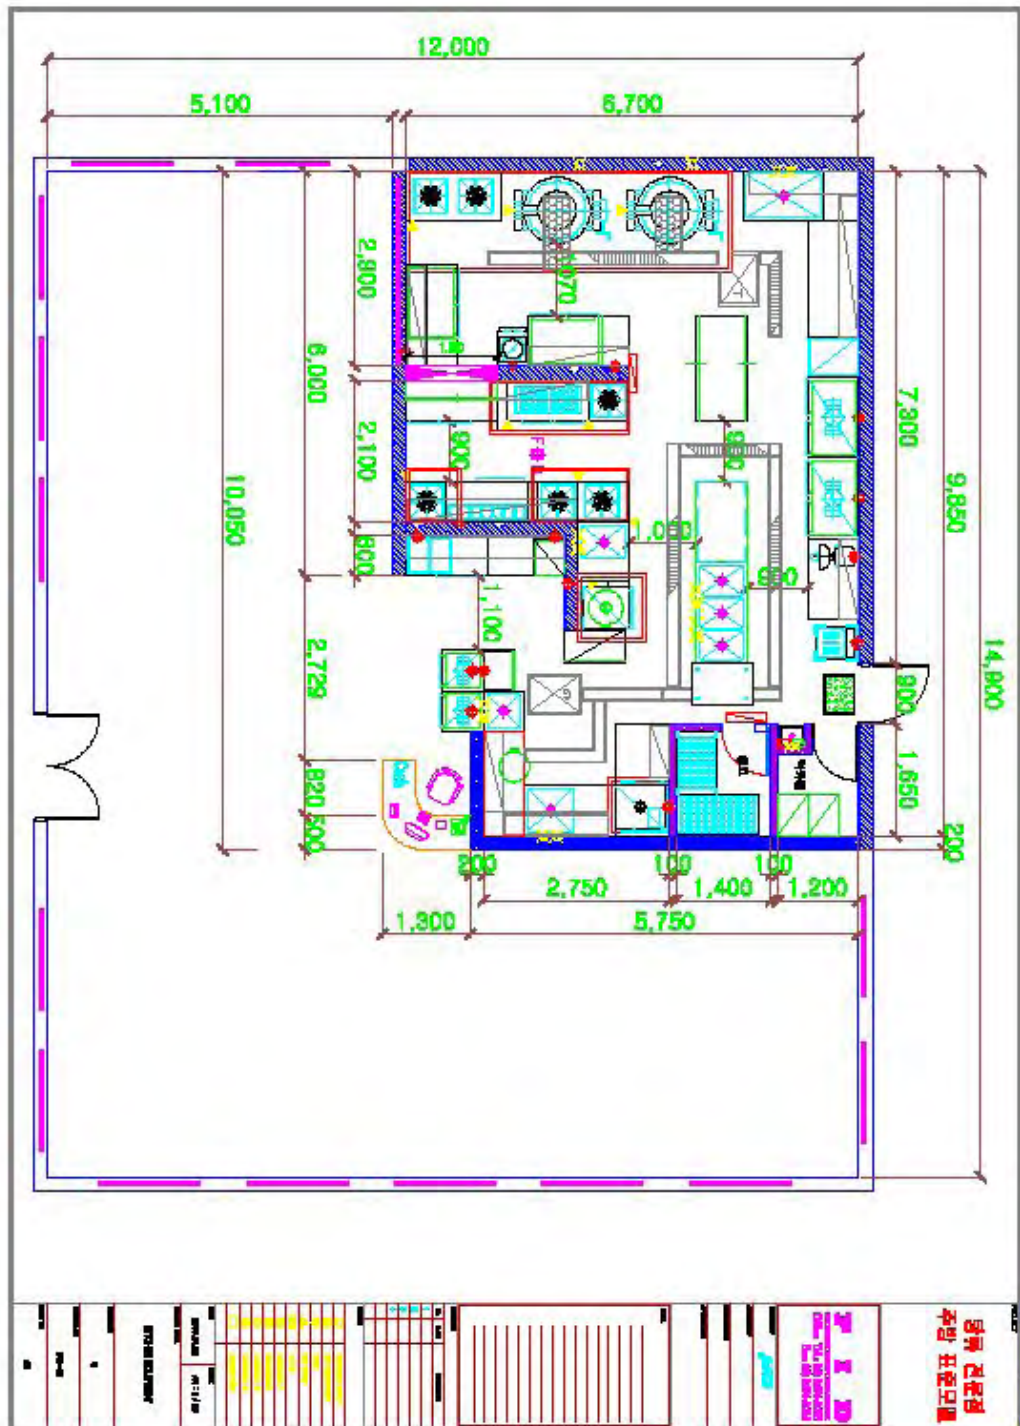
Floor plan for Seollungtang speciality restaurant excluding hall
